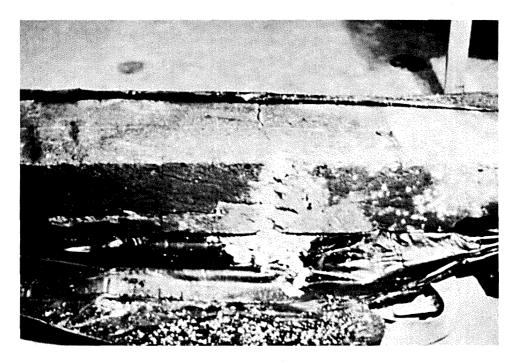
Longitudinal crack on bottom of beam at reinforcement
